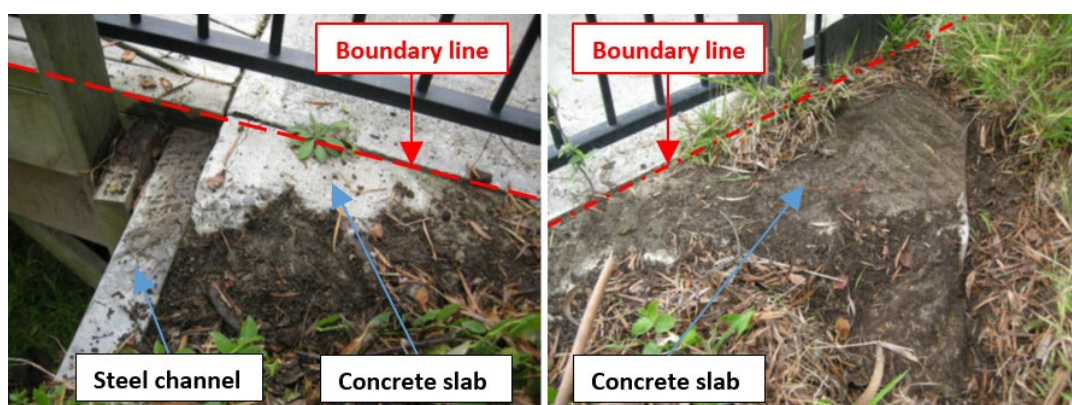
View from 56 Moncks Spur Road looking down onto concrete slab encroachments
